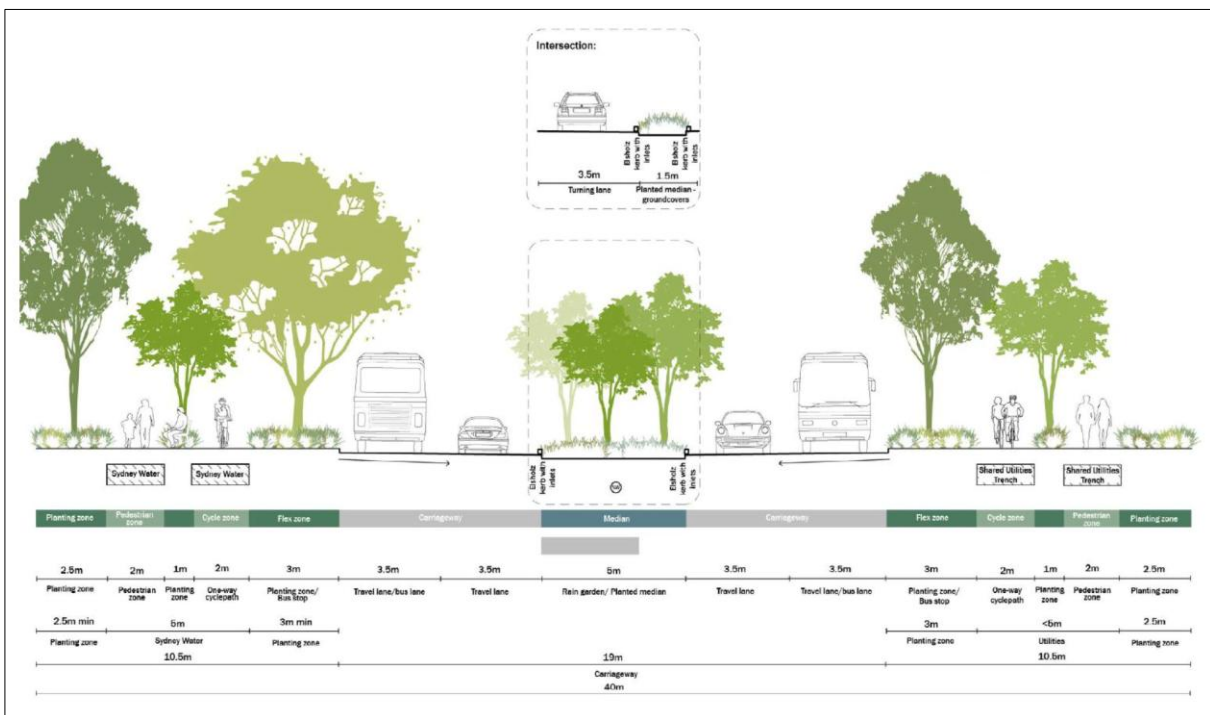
Sub-Arterial Road Typical Arrangement, DCP
